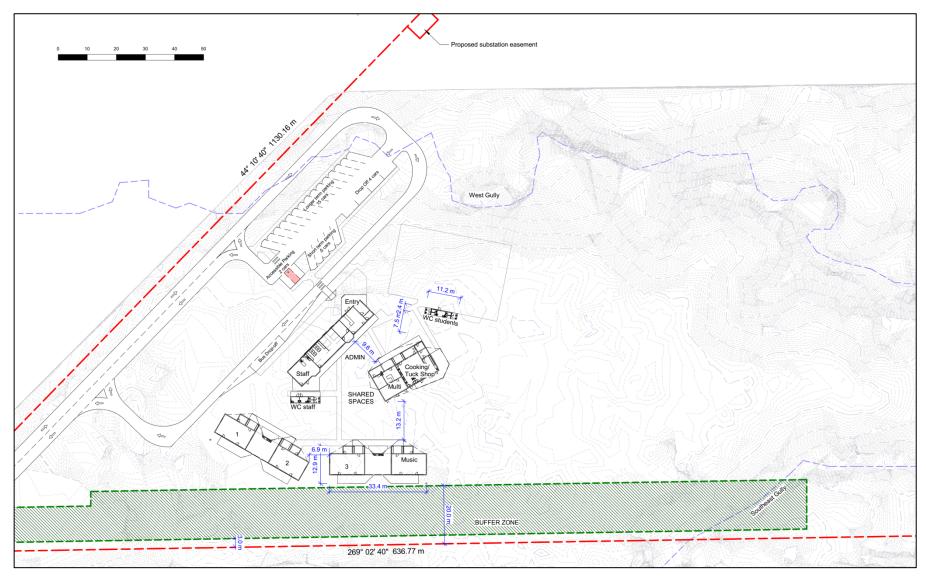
PROPOSED STAGE 2 PLAN
